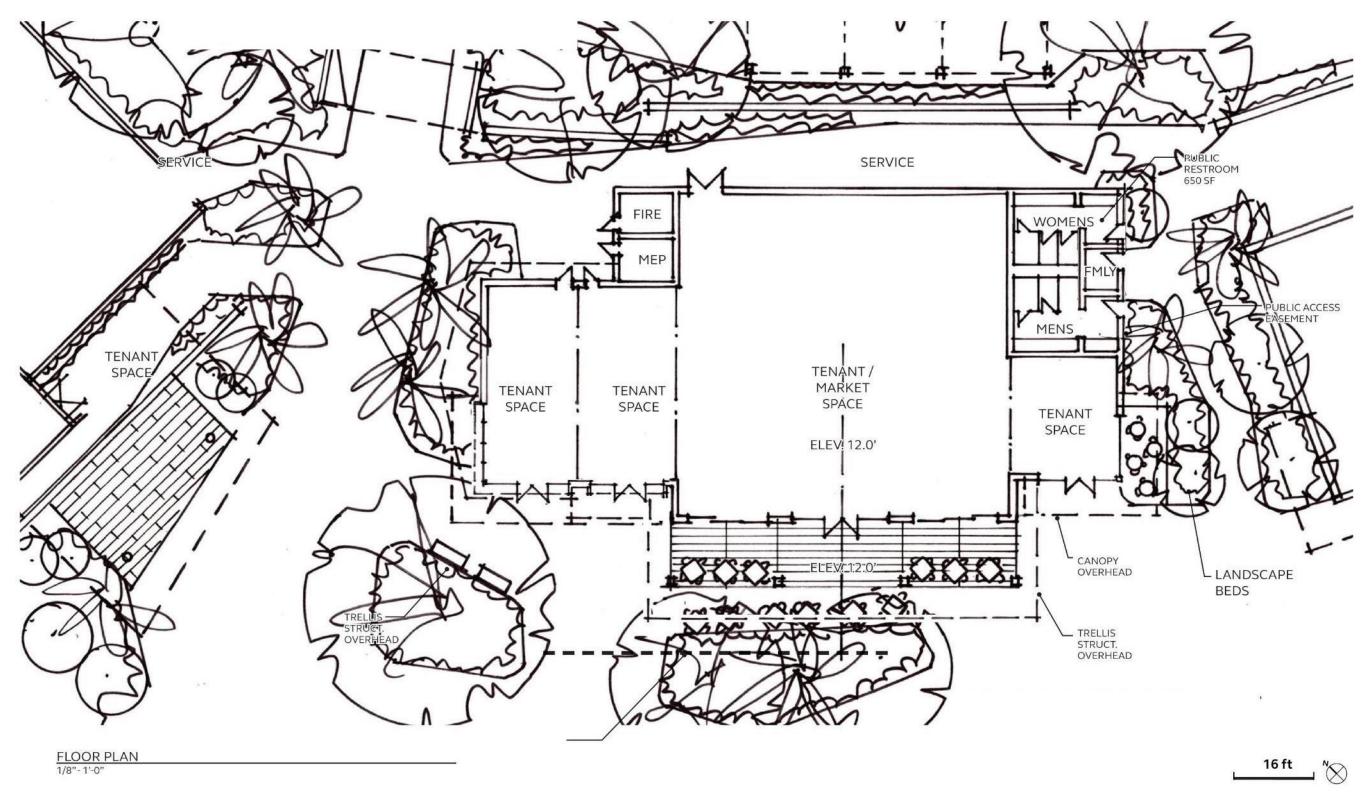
Retail Building 3, Market – Preliminary Plan
